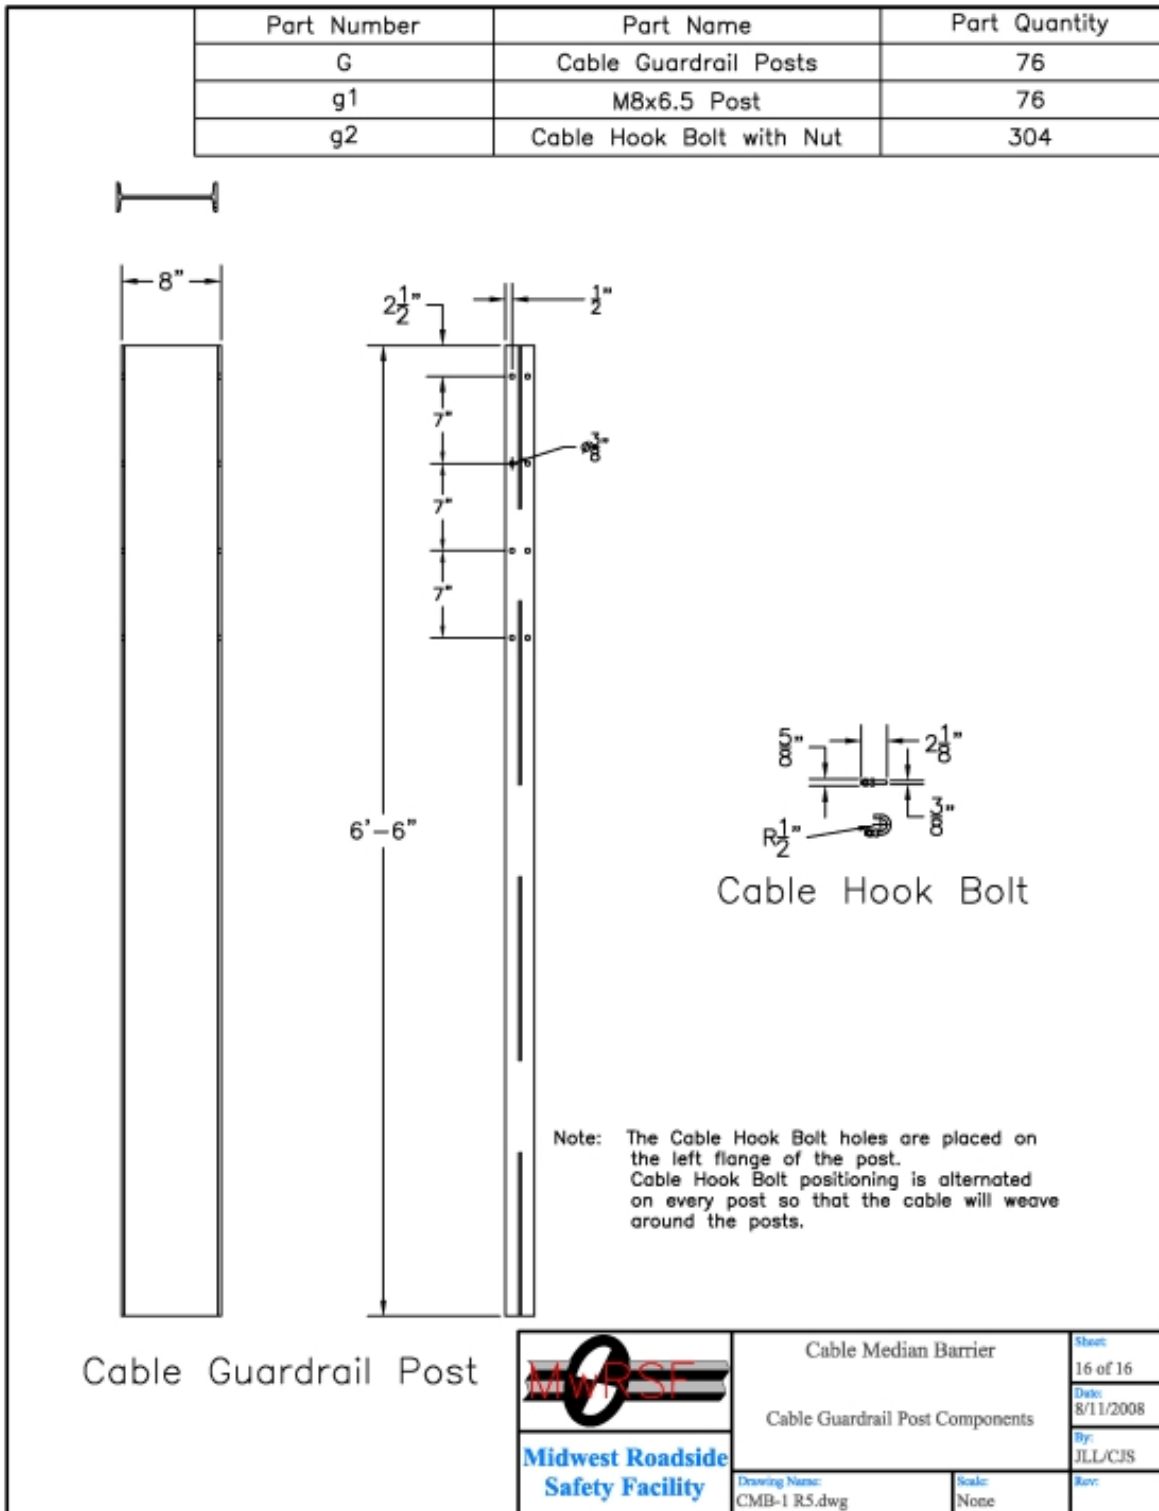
Cable Guardrail Post Components (English), Design No. 1
